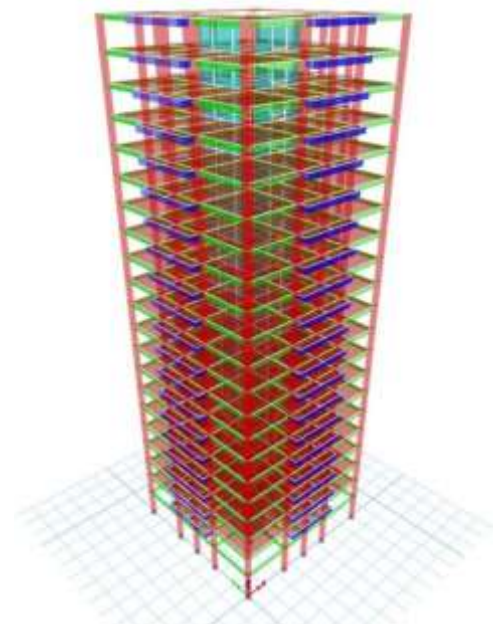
3D view of all steel beam-concrete column hybrid structure
